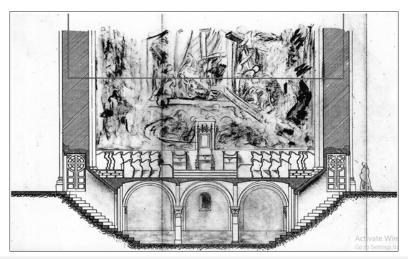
The new arches and vaults, rebuilt according to the hypotheses of the founded remains, rise above the pavement of the cathedral (archive: Manuel Gausa Raspall architect).
